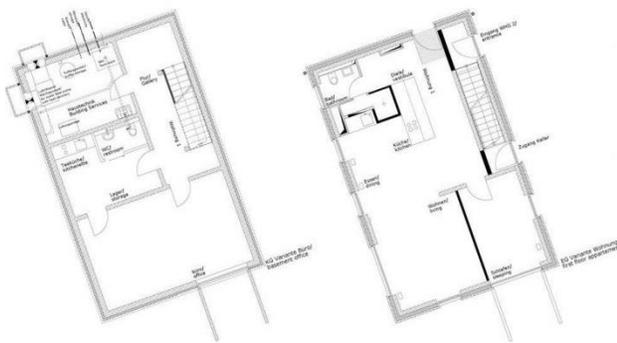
The floor plan adaptability: basement, 1-st floor, (black walls conversion from office to separate dwellings). Author: Cynthia Despang.
